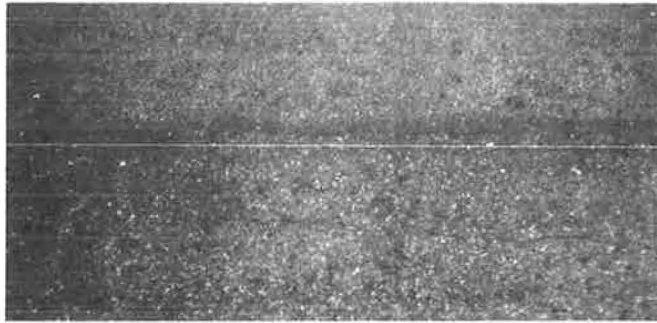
Reflection crack in standard mix, stopping short at longitudinal boundary of asbestos section (dark area left of center), Strodtman Place at Grand Avenue, St. Louis, Mo., September 1962.
